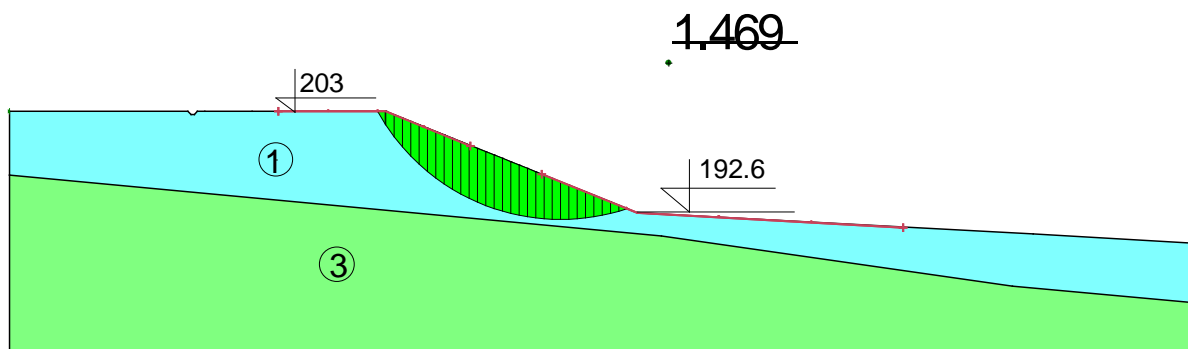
New landfill excavation – Section 22, Static conditions, $F_s=1.469$
